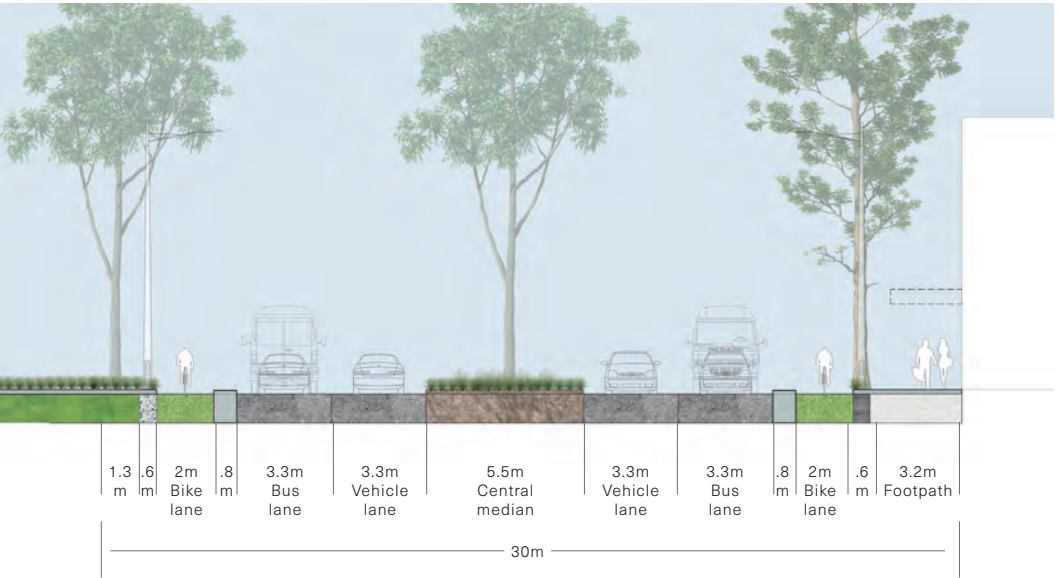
Section A-A' of Mercer Street south block showing the proposed condition
